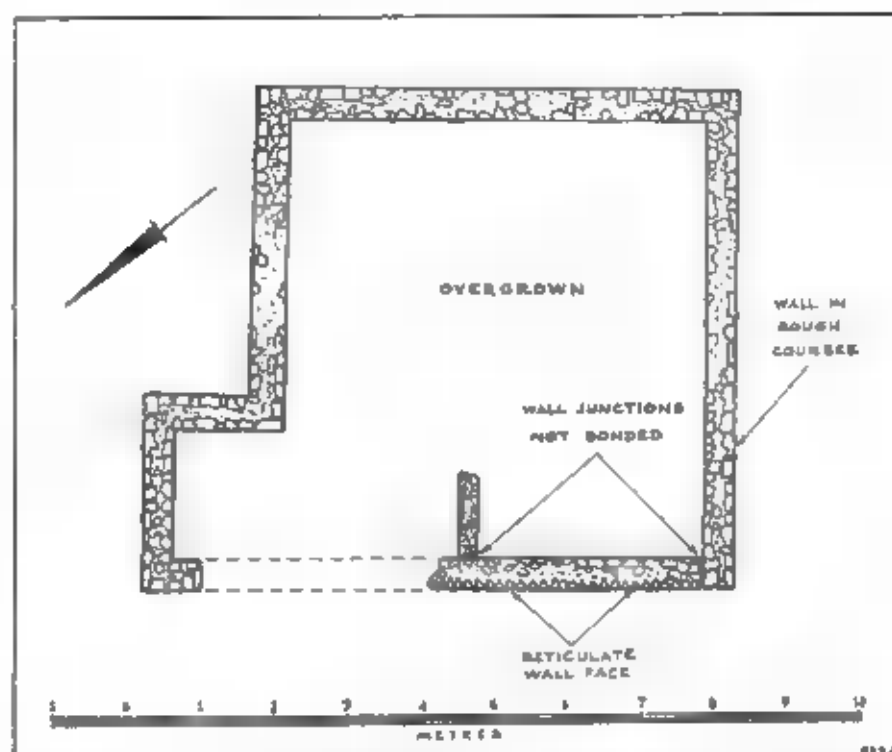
MONTE CUCULO: PLAN ■ SITE 204
